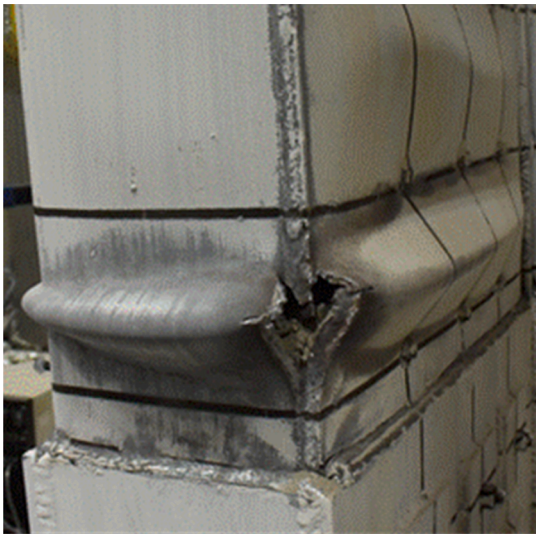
Vertical weld fracture at the corner of the NWS and NWW surfaces.
